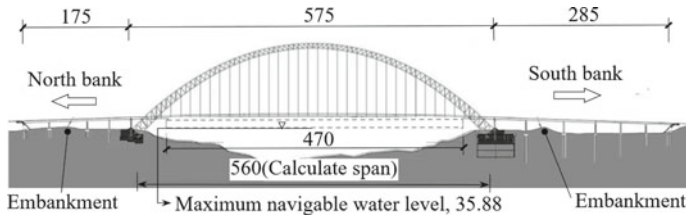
Elevation of Third Pingnan Bridge (unit: m)
